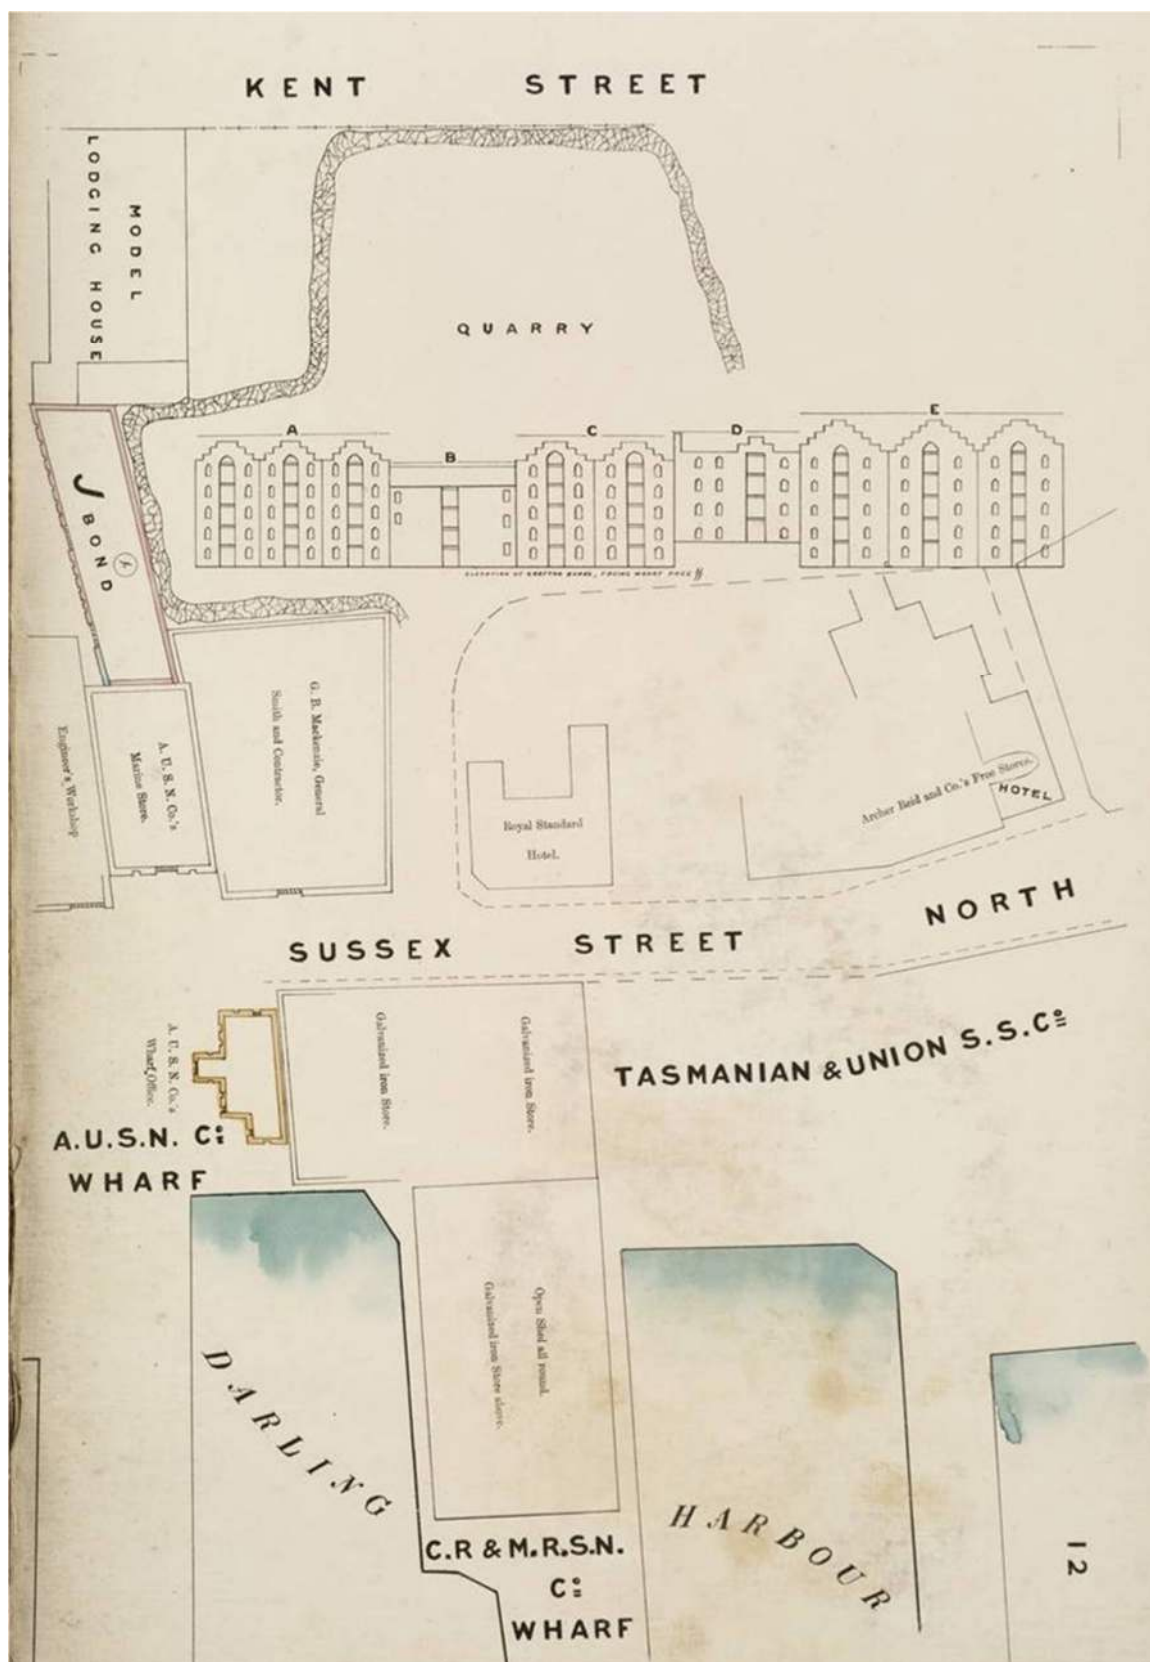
This 1894 plan (not accurate) showing the area around the Grafton Bond stores had been quarried in the early 1880s to allow for the construction of the stores. An elevation of the facades of Grafton Bond Buildings is included on the plan. G Mahlstedt: *Sydney Bonda and Free Store Plans*, pg. 12, 1894 MAX 811.17/1894/1 (Mitchell Library and on line) [Digital order No. a1920015].
